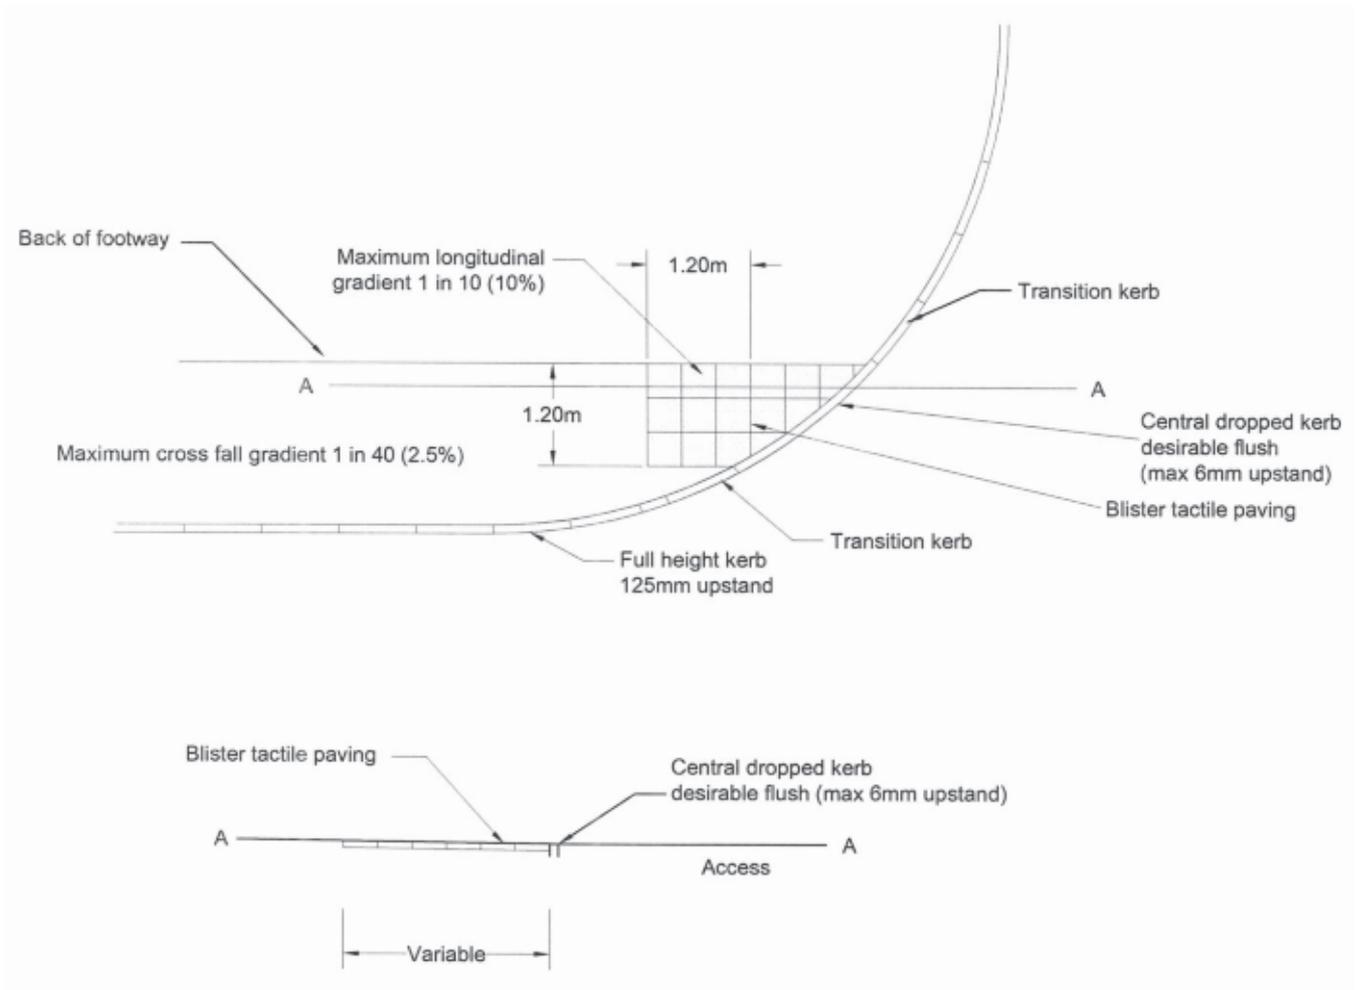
Kerb and tactile paving detail in respect of standard access to 2 to 5 dwellings (to be used on Class 3 highway).
